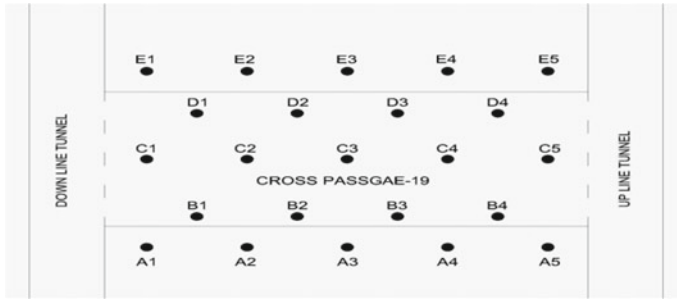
Plan showing TAM grouting carried from the ground above CP-19
